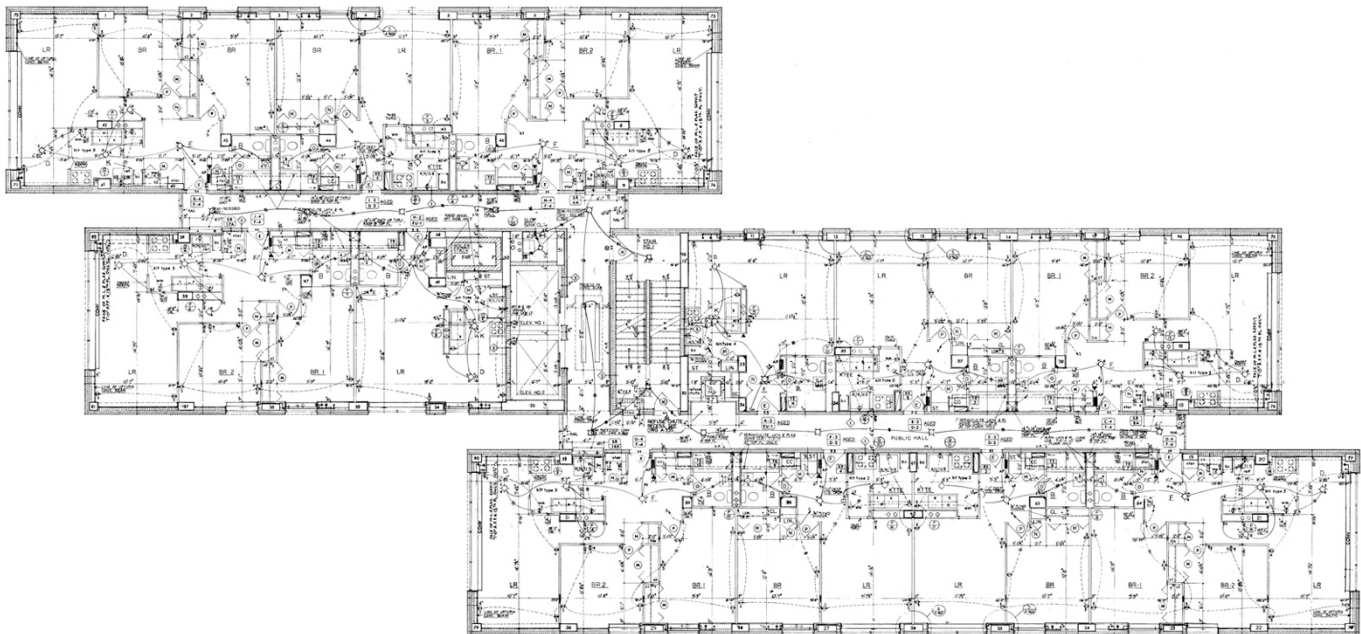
Typical fifteenth through twentieth floor plan showing a combination of studios, one-bedroom, and two-bedroom apartments, 1969. The two-bedroom apartments are located at the shorter north and south ends of the building. (NYCHA)
